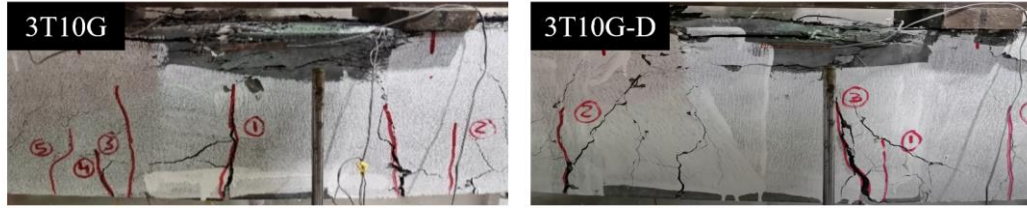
Failure modes and cracking patterns of the 3T10G beam.
